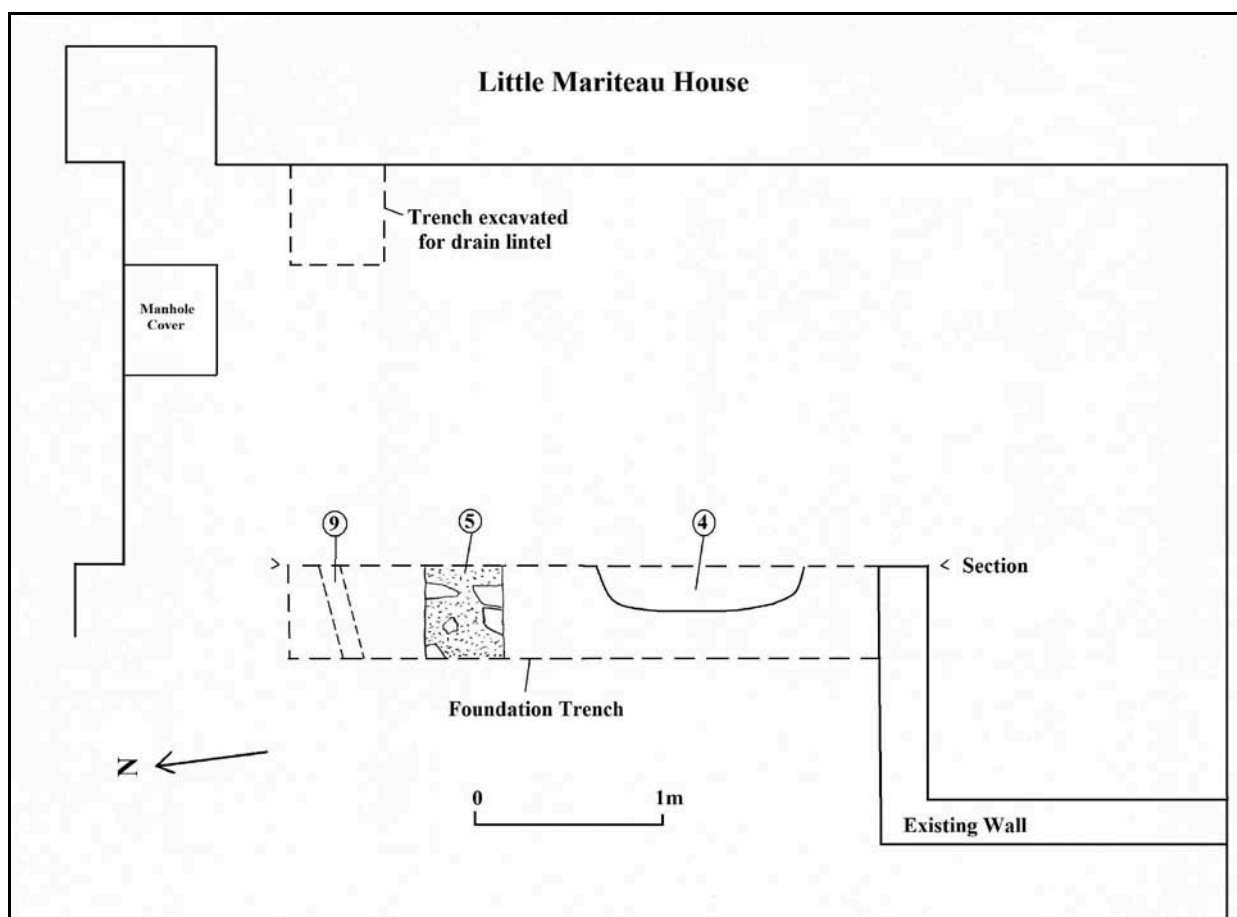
Little Mariteau House, Winchelsea: Site Plan
